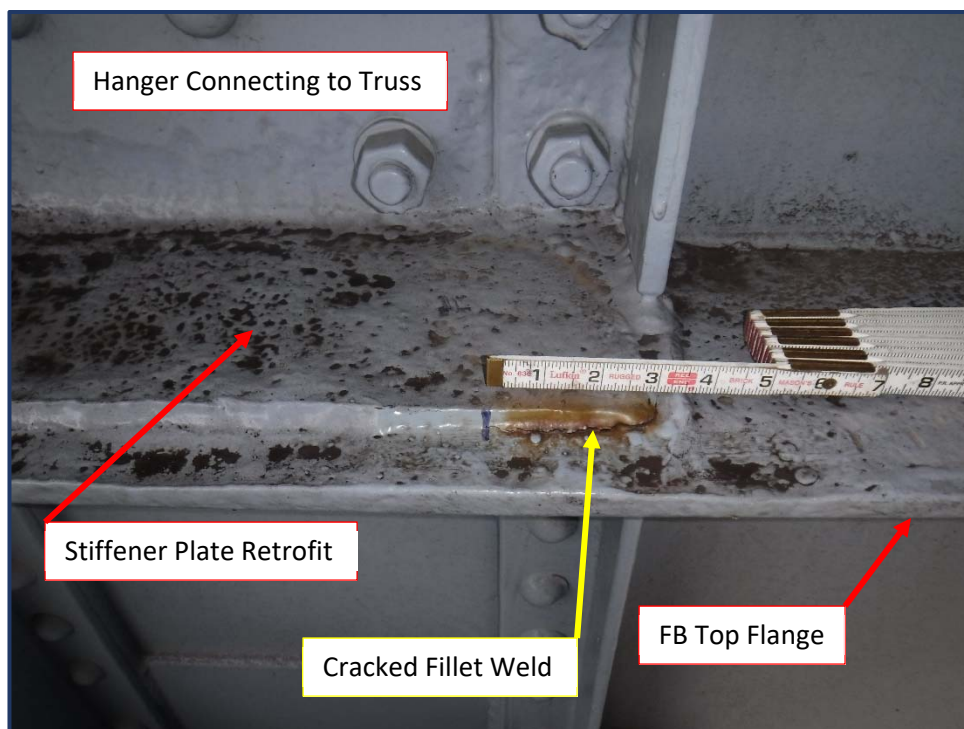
Cracking at Lower Deck Floorbeam Stiffener Plate Retrofit
